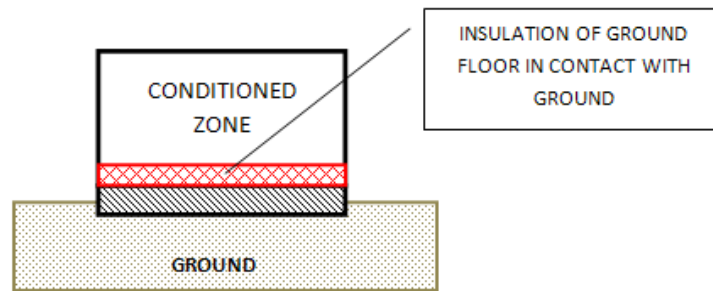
Insulation of ground floor in contact with ground (above the concrete ground) (Source: Boneta et al., 2013)
